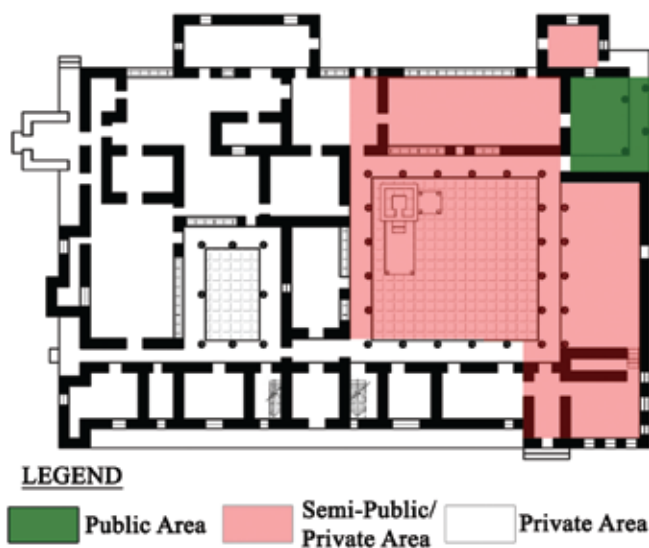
Typical Plan of *Nalukettu* - showing Private, Semi Private and Public Area, Source: Author
